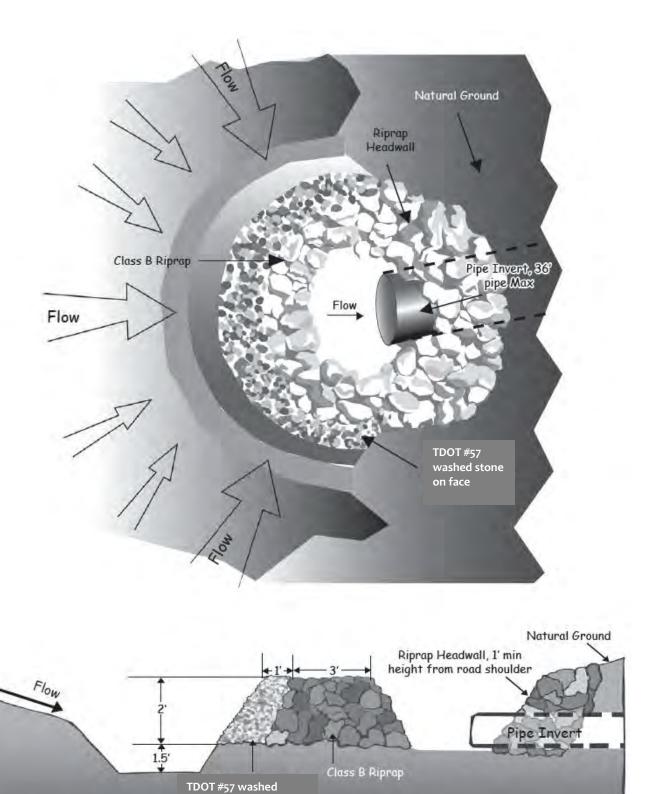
Rock Pipe Inlet Protection (Source: NCDENR)
